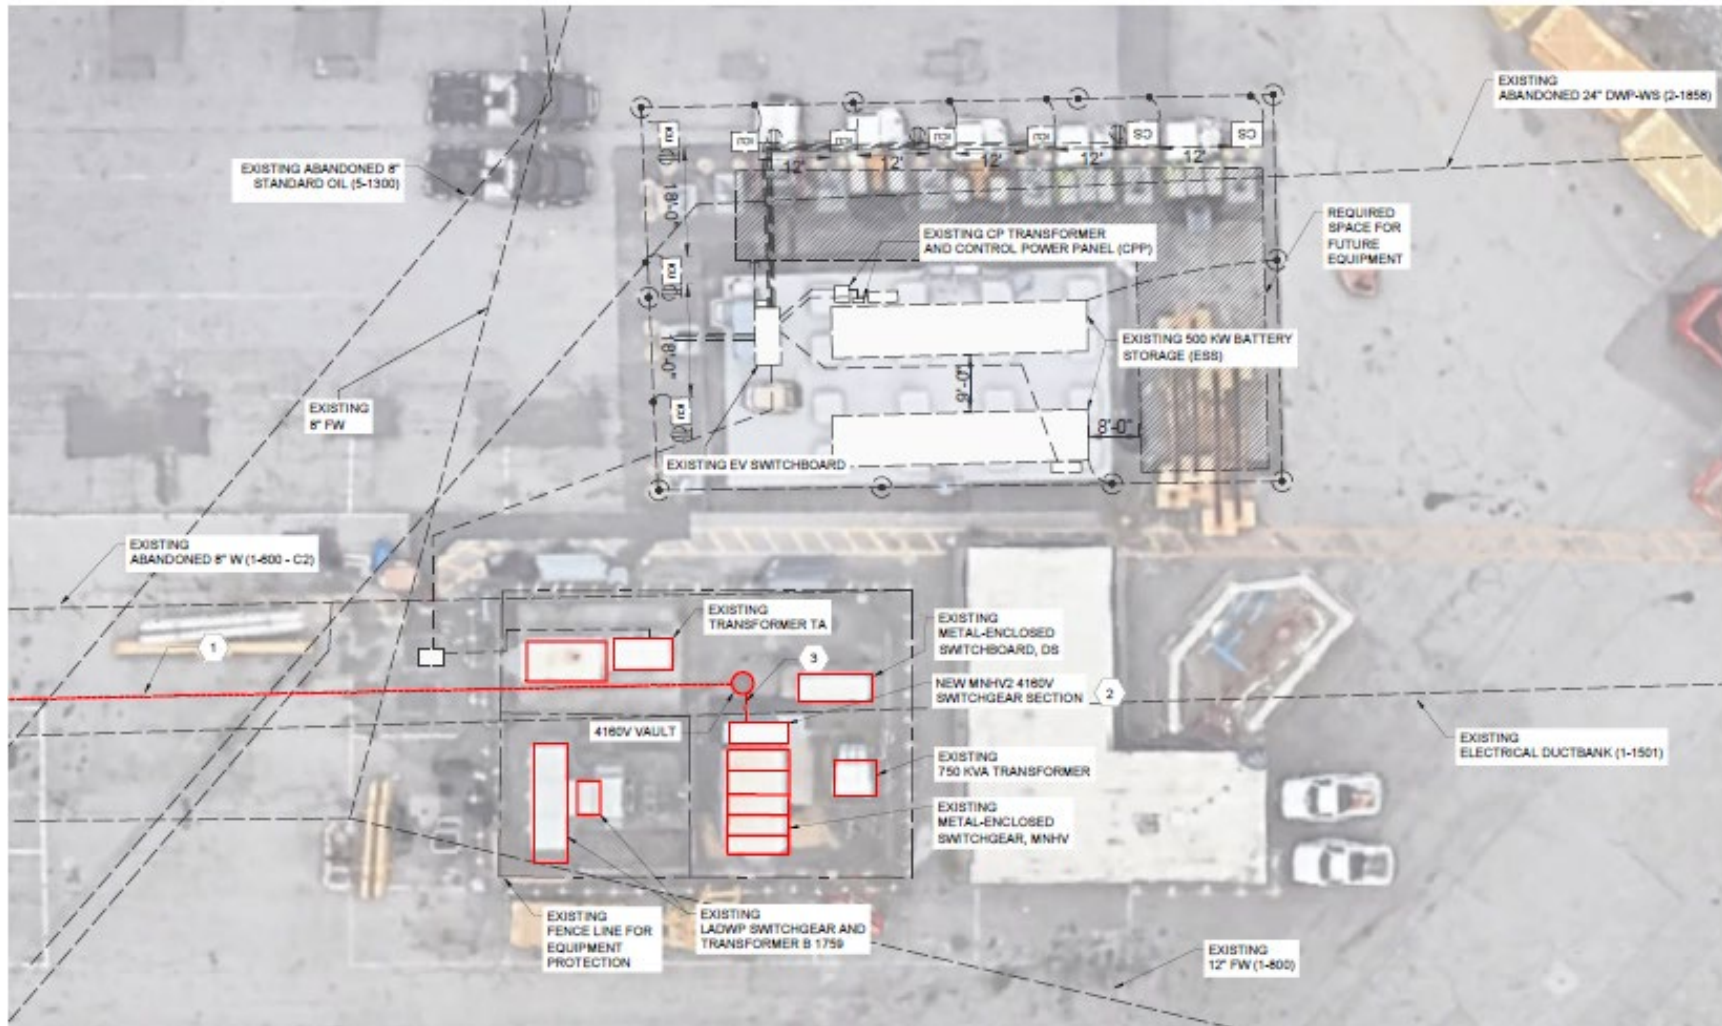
Constructed Electrical Infrastructure Supporting the Battery Energy Storage System and Electric Vehicle Chargers
